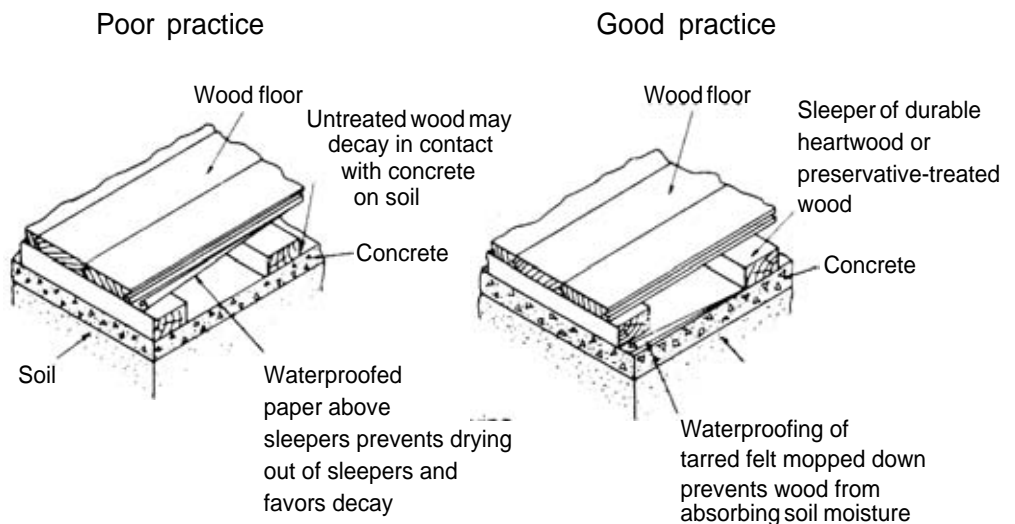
Wood floors on concrete slabs. Waterproofing membranes may be placed in, under, or on top of the slab.
